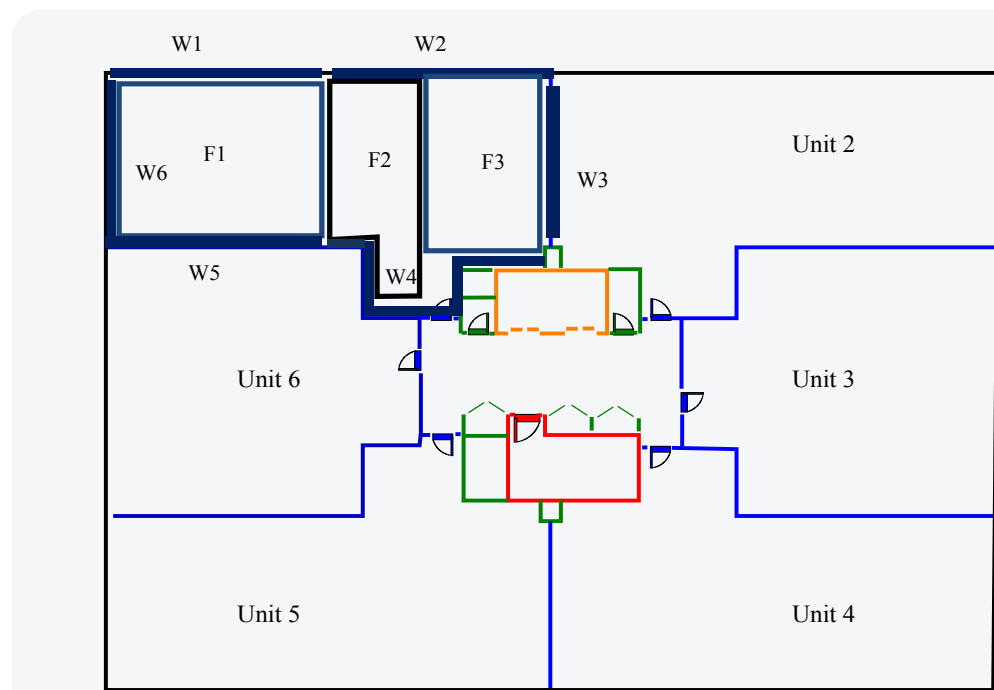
Schematic showing simple structural layout for an apartment in a timber building.
